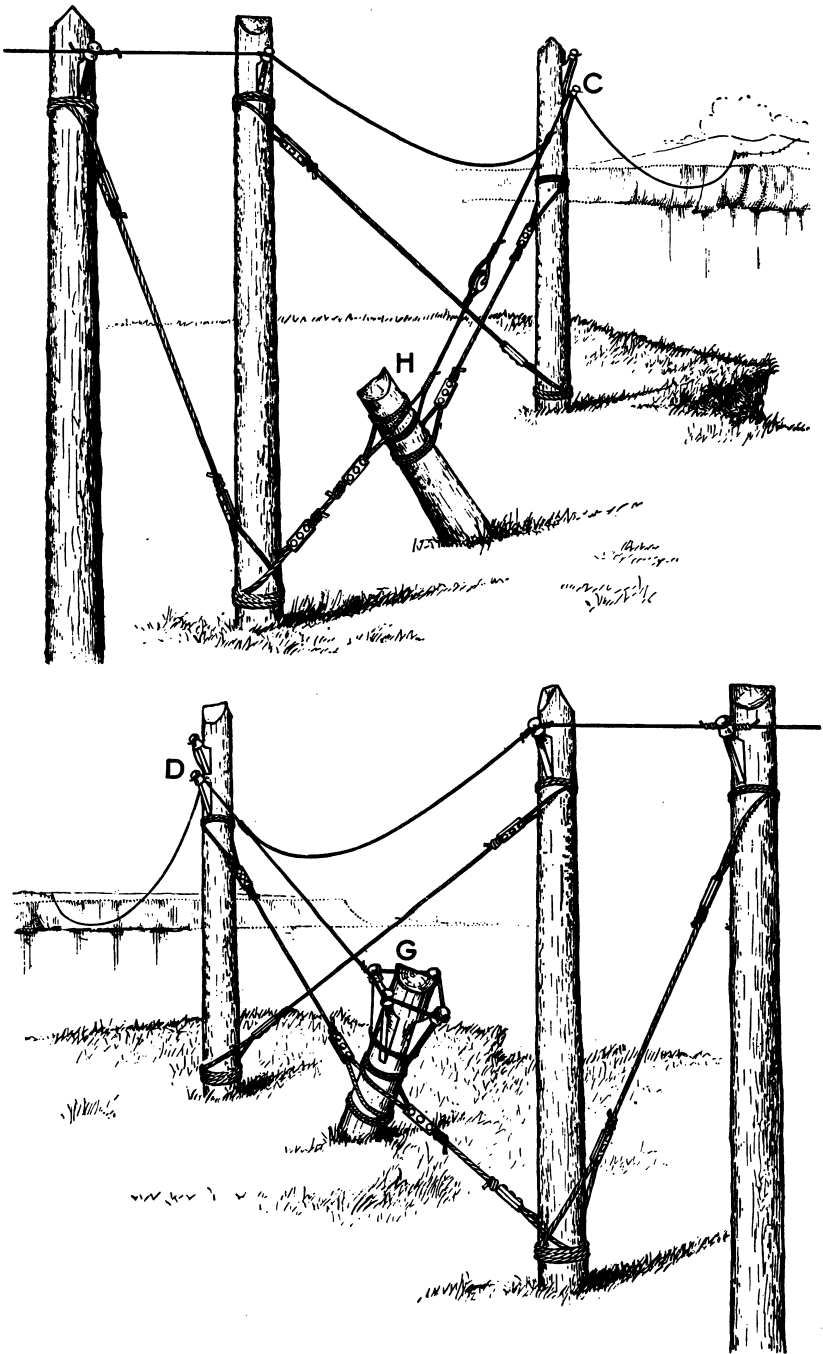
AERIAL LINE CONSTRUCTION, LONG SPANS, METHODS OF TERMINATING.
